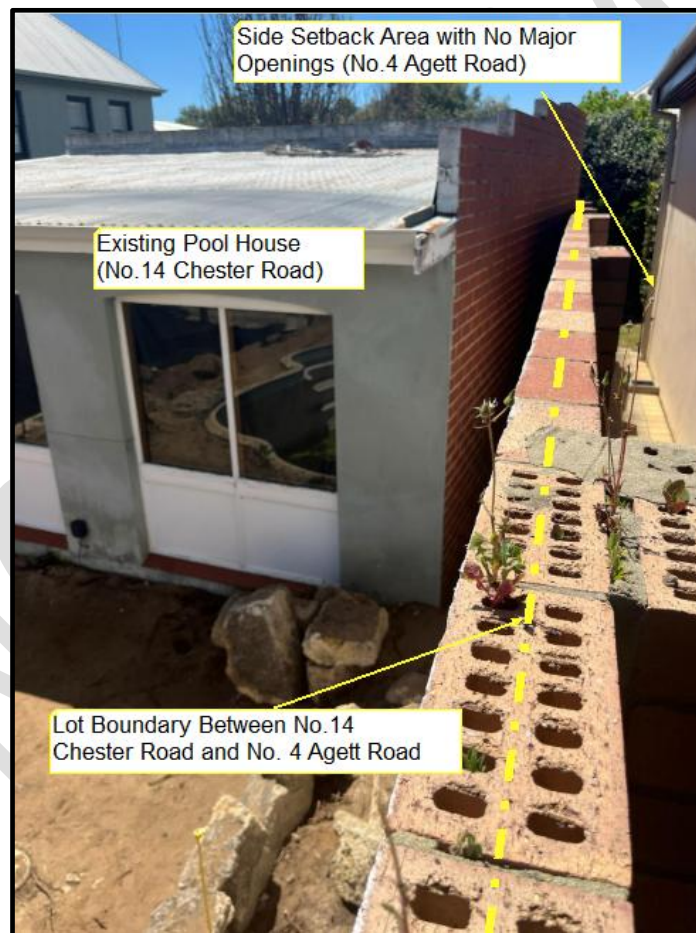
Existing Boundary Wall and Adjoining Side Setback Relationship
